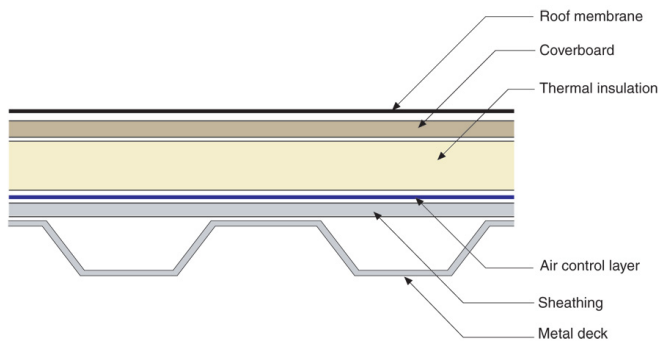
Perfect Compact Roof: The roof I would build if I was in charge. A continuous fully adhered air control layer supported by gypsum sheathing on the top of a metal deck. The gypsum sheathing is screwed to the metal deck. Rigid thermal insulation on the top of this air control layer—in two layers at least with the joints off-set horizontally and vertically. This insulation should be screwed down to the metal deck. Then on top of the rigid thermal insulation there should be a coverboard. This coverboard is also screwed down to the metal deck. Finally, a roof membrane is fully adhered to the coverboard.
